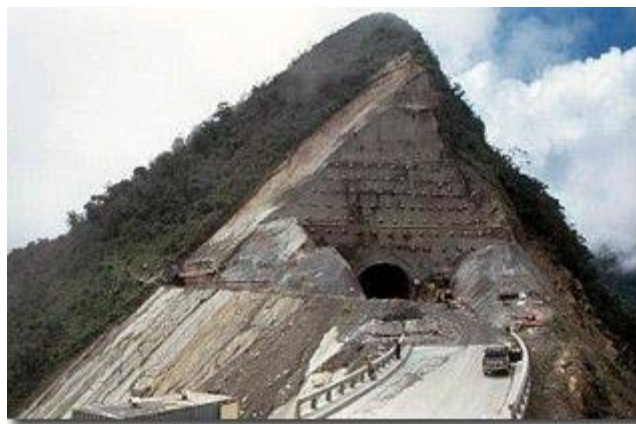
Dynamite makes it possible to build roads, tunnels, and canals through rock
